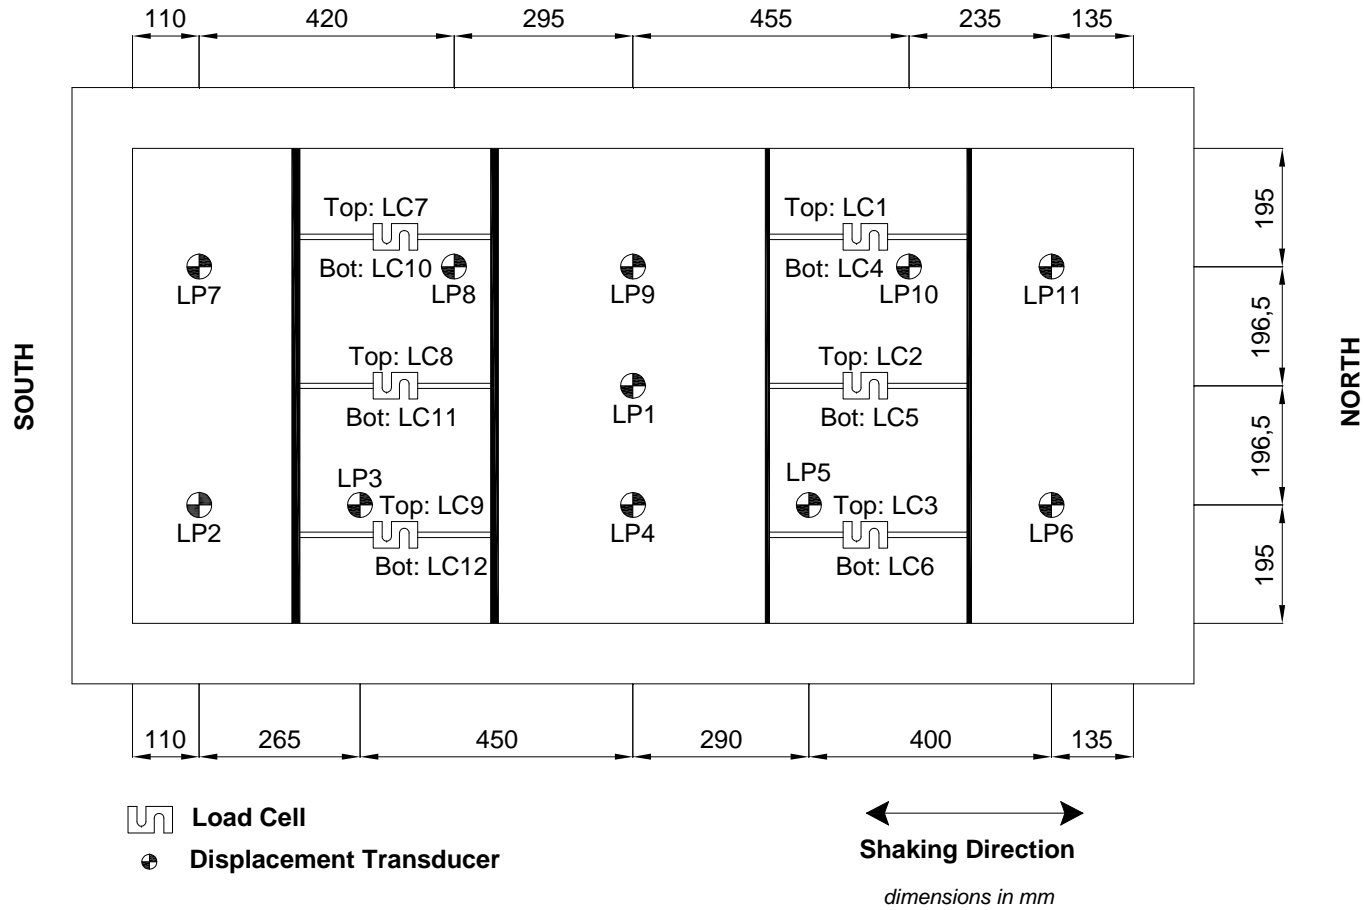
ROOZ01 model configuration, plan view (dimension in mm).
